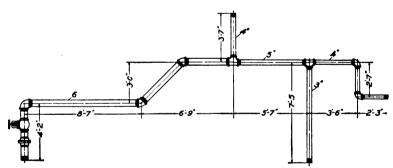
Dimensioned Sketches for Cutting Pipe.
